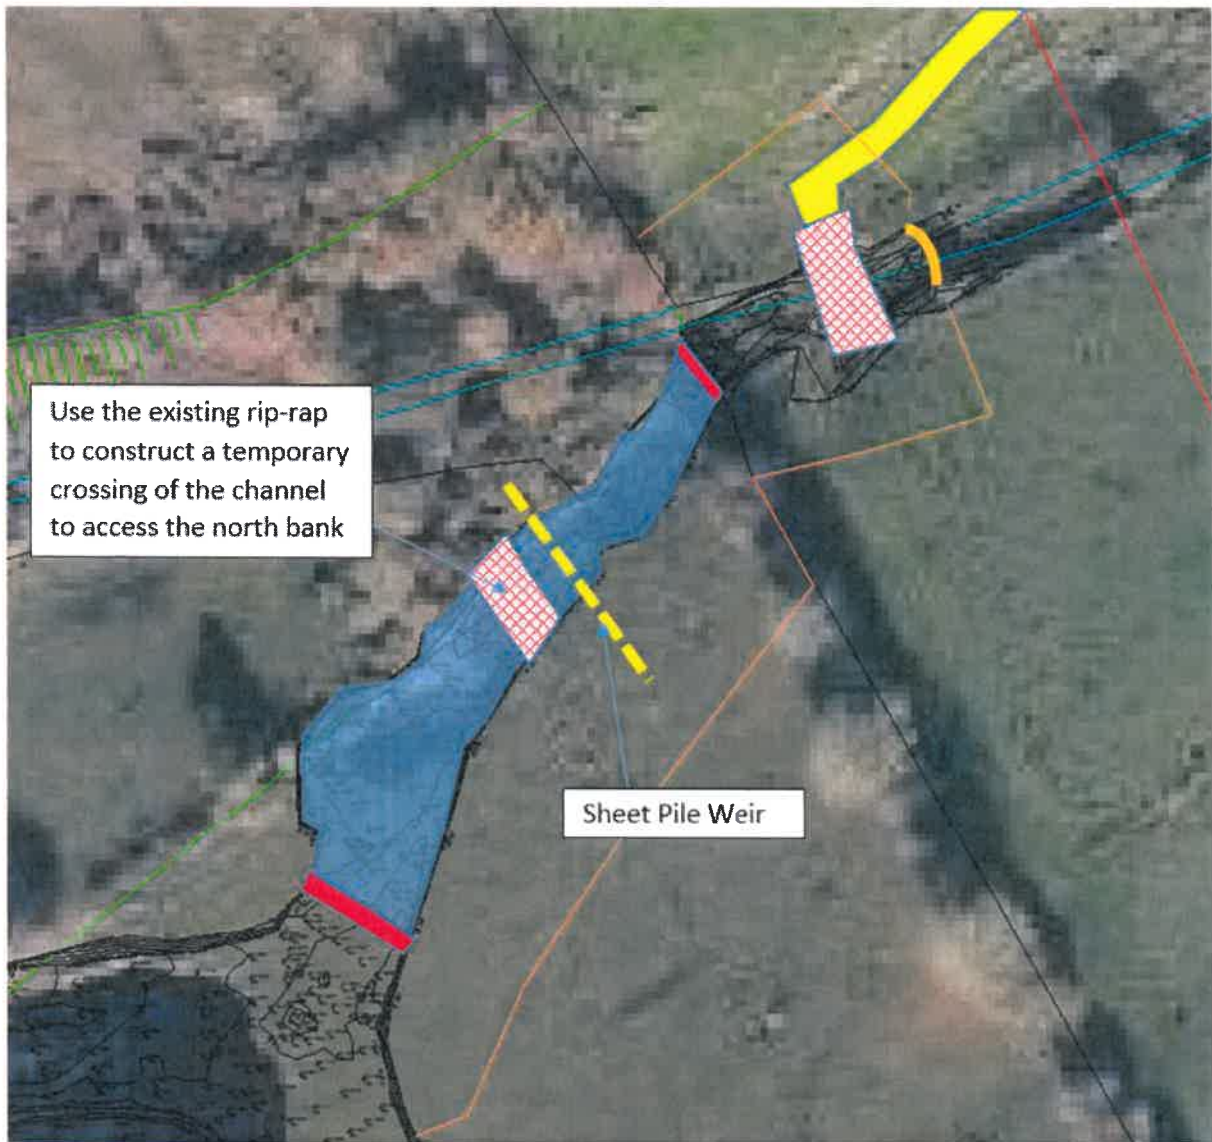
STEP 5a Install temporary crossing of the channel upstream of the proposed weir site using the existing rip-rap to facilitate passage from south to north bank (left bank) of the breach, Carry out clearance works on north bank to facilitate works. Remove the sheet pile weir from the north bank southwards..
